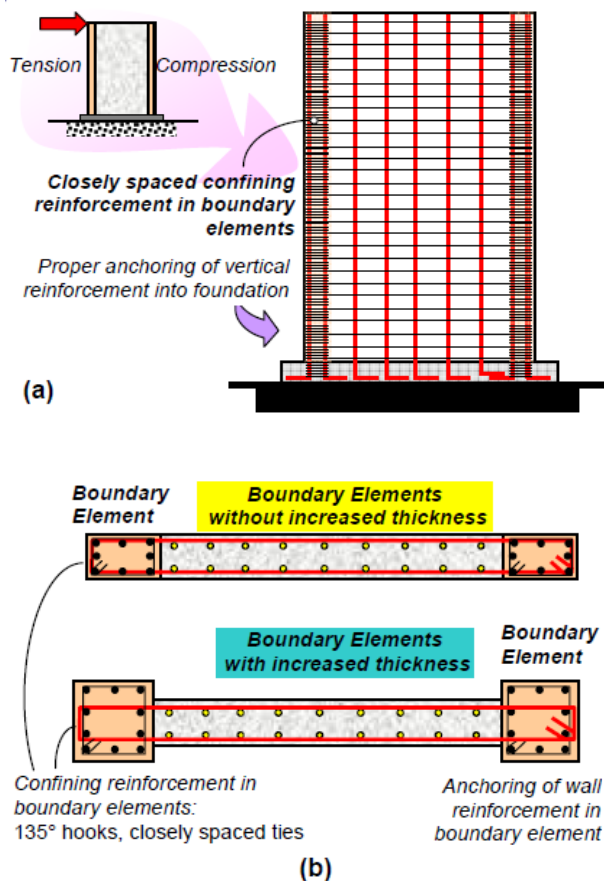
Layout of Main Reinforcement in Shear Wall as per IS:13920:1993
